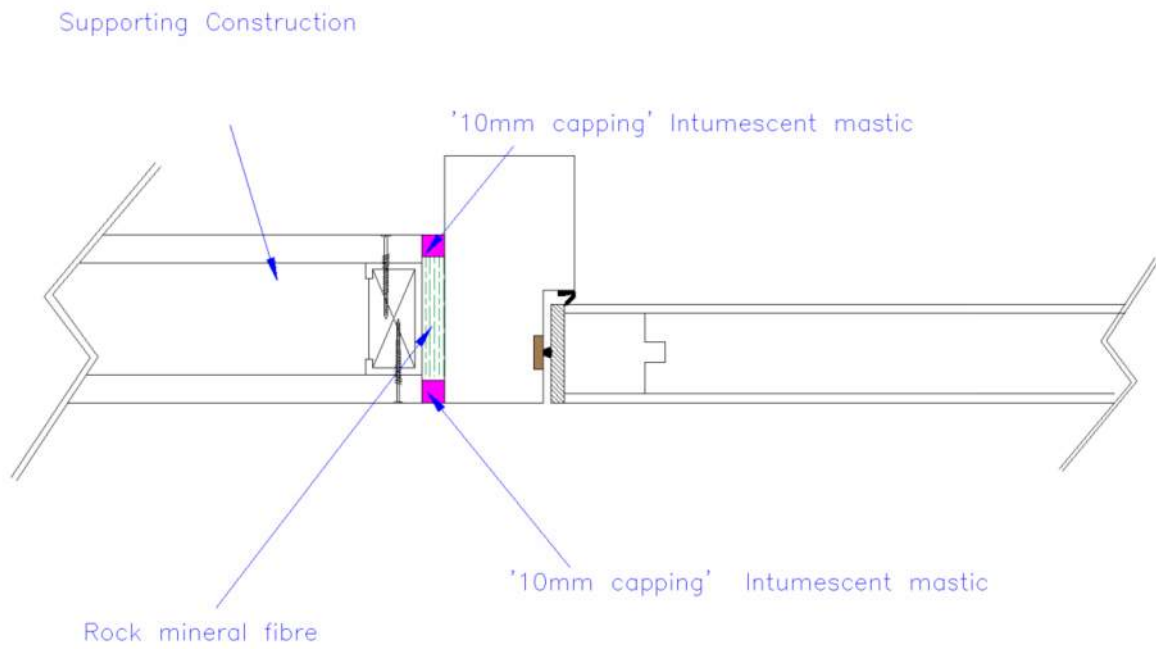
Details of Supporting Construction to Frame, Fire Stopping Doorset A
